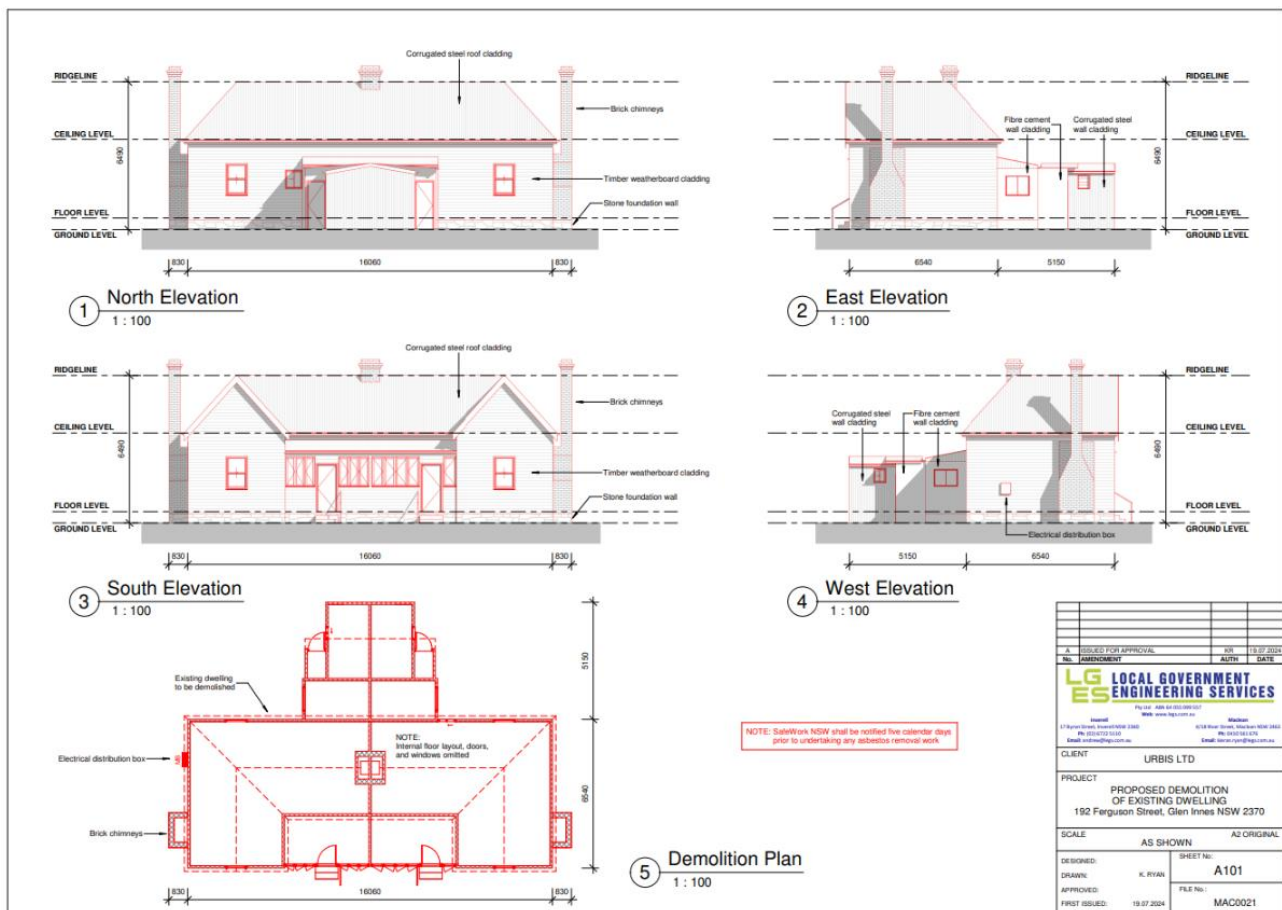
Extract of proposed plans showing the demolition plan and elevations.
